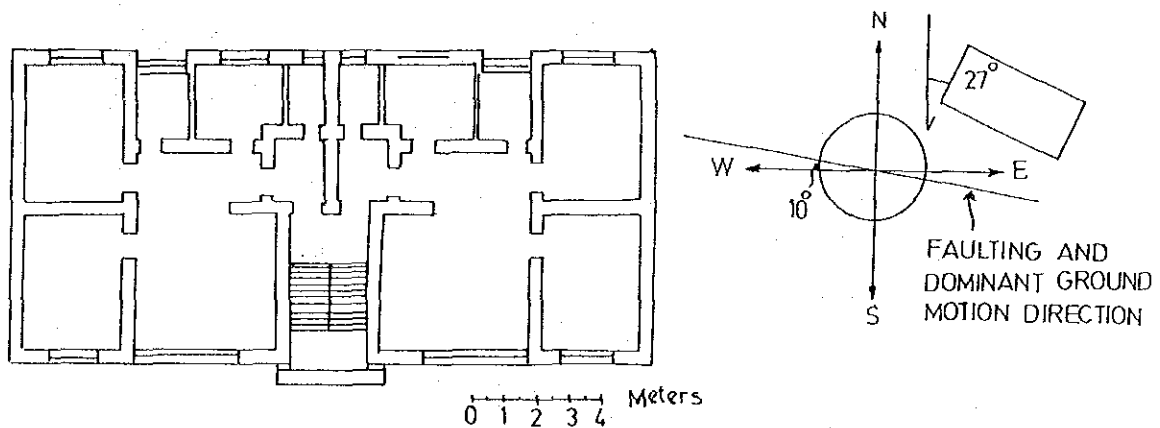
Plan and Orientation of Muradiye Staff Housing.
